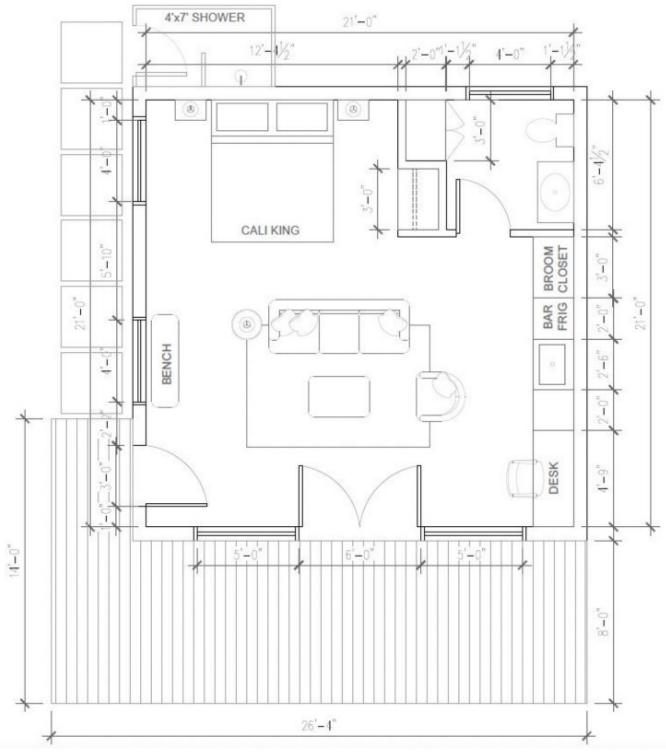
Preliminary Sleeping Cabin Floor Plan (Source: Maddee Rose Design)
